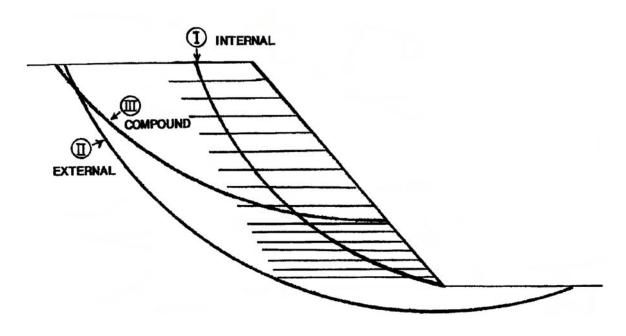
Failure modes for Reinforced Soil Slopes.
